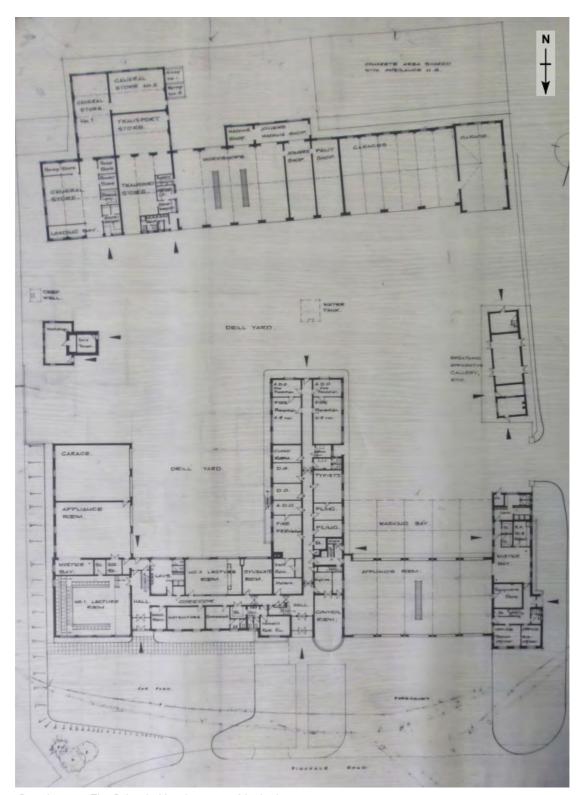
Fire Brigade Headquarters Building, ground floor plan, c. 1960
